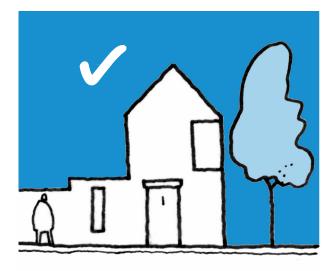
A single storey design that incorporates the existing boundary wall and introduces a window or door that helps to animate the street will be looked upon favourably.
